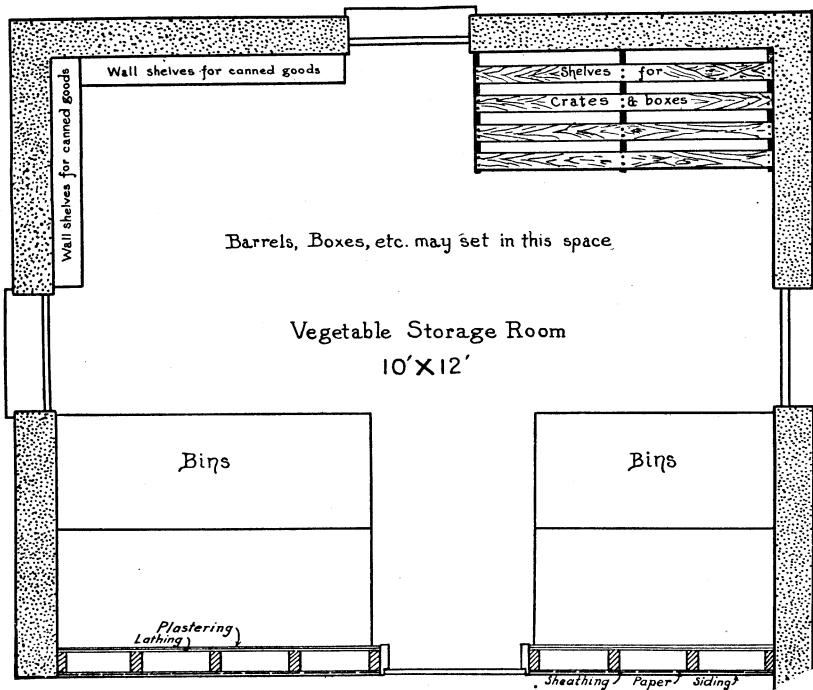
Floor plan, showing the possibility of constructing a storage room by partitioning off the portion of the cellar under the wing of the house.
